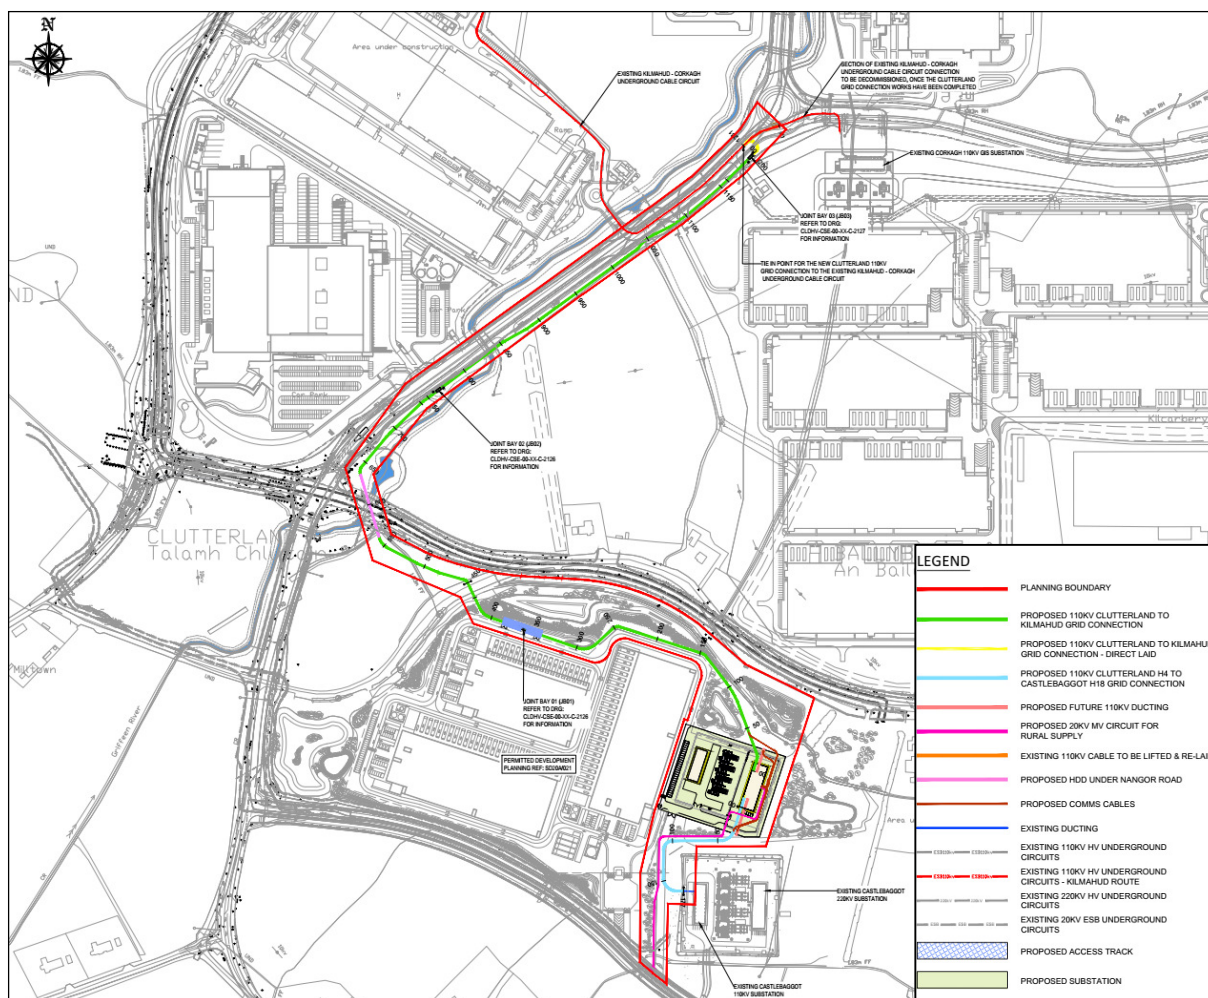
Proposed site layout plan of the Proposed Development site (red line) indicating proposed 110kV transmission lines (green and cyan line), proposed 49kV (pink) as well as the permitted development site (blue line) (Source: Drawing no. CLDHV-CSE-00-XX-DR-C-2102, CSEA Consulting Engineers)
